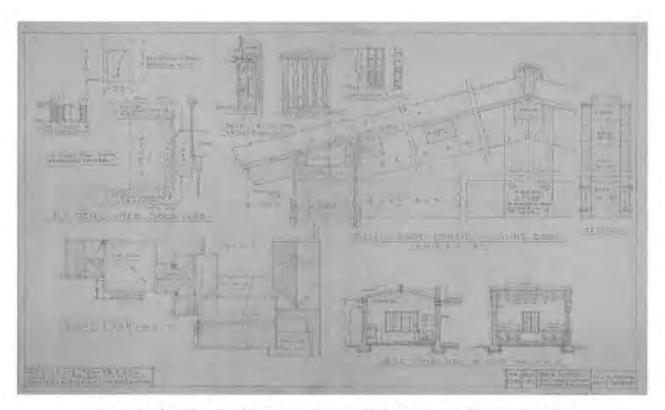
Joesler Plan details (Johnson House) 1931, Arizona Architectural Archive
